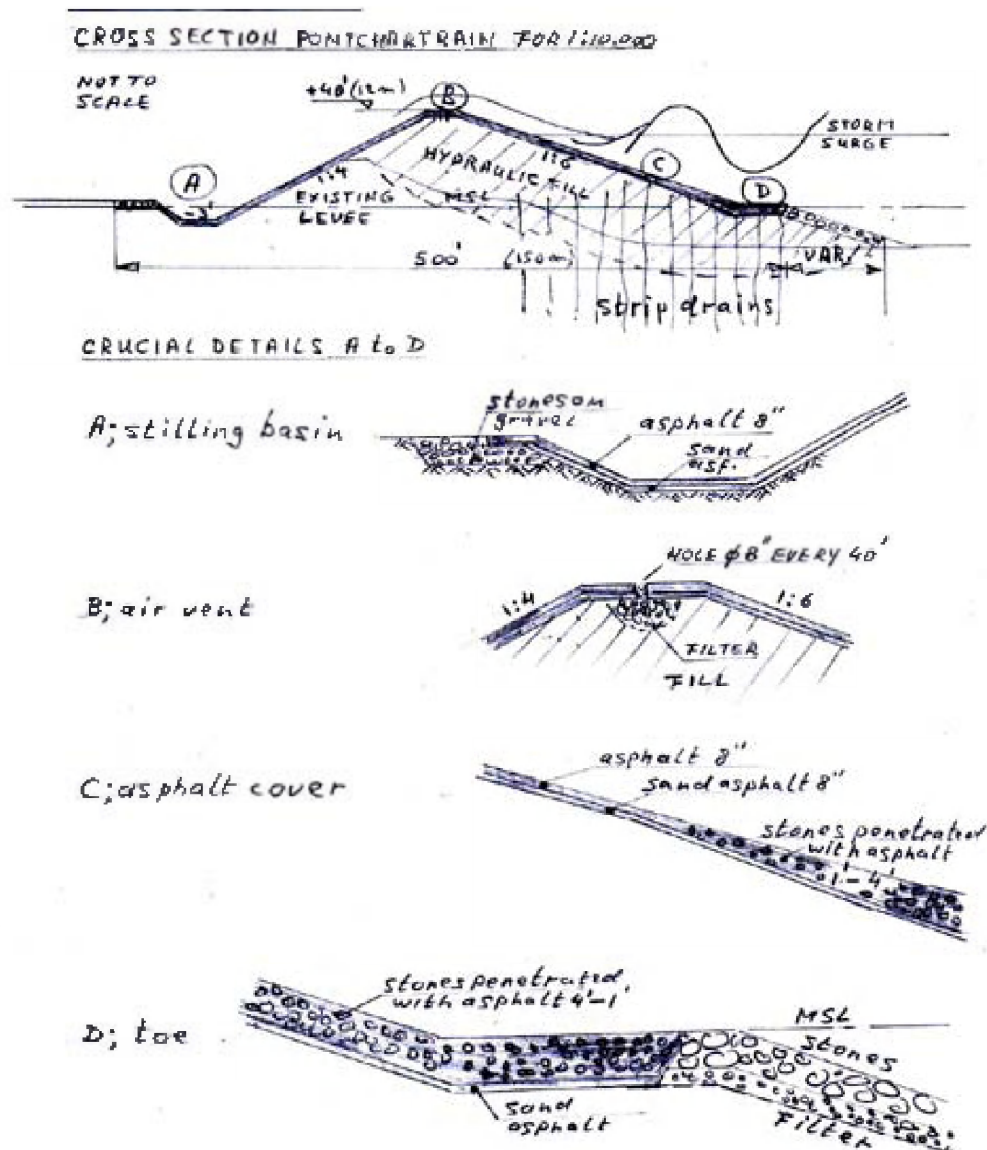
Schematic design for upgrading an existing levee, with several construction details
